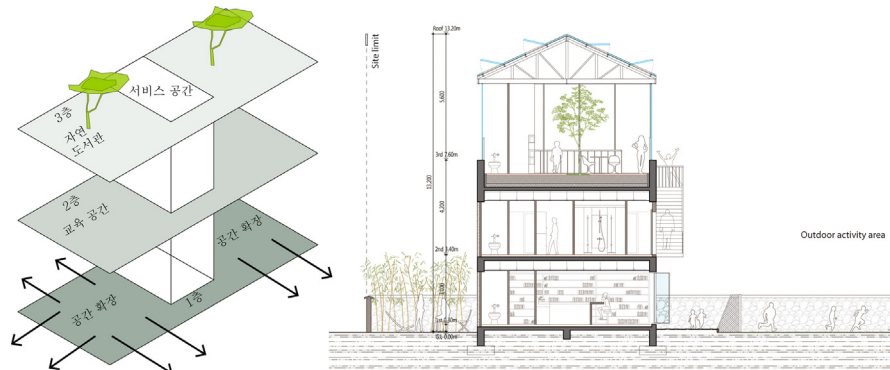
Concept Diagram \_ Junior Centre Plan & Section
